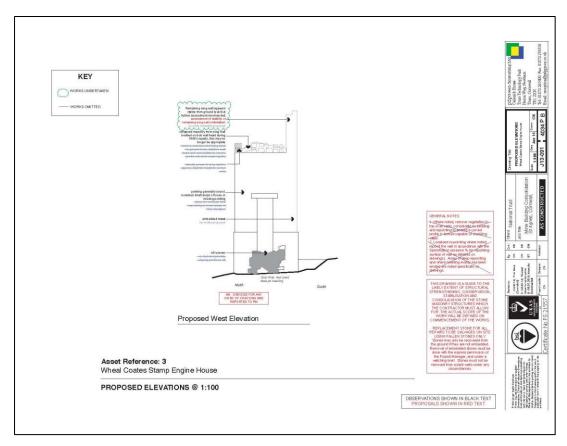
Western external elevation of Wheal Coates stamps engine house.
